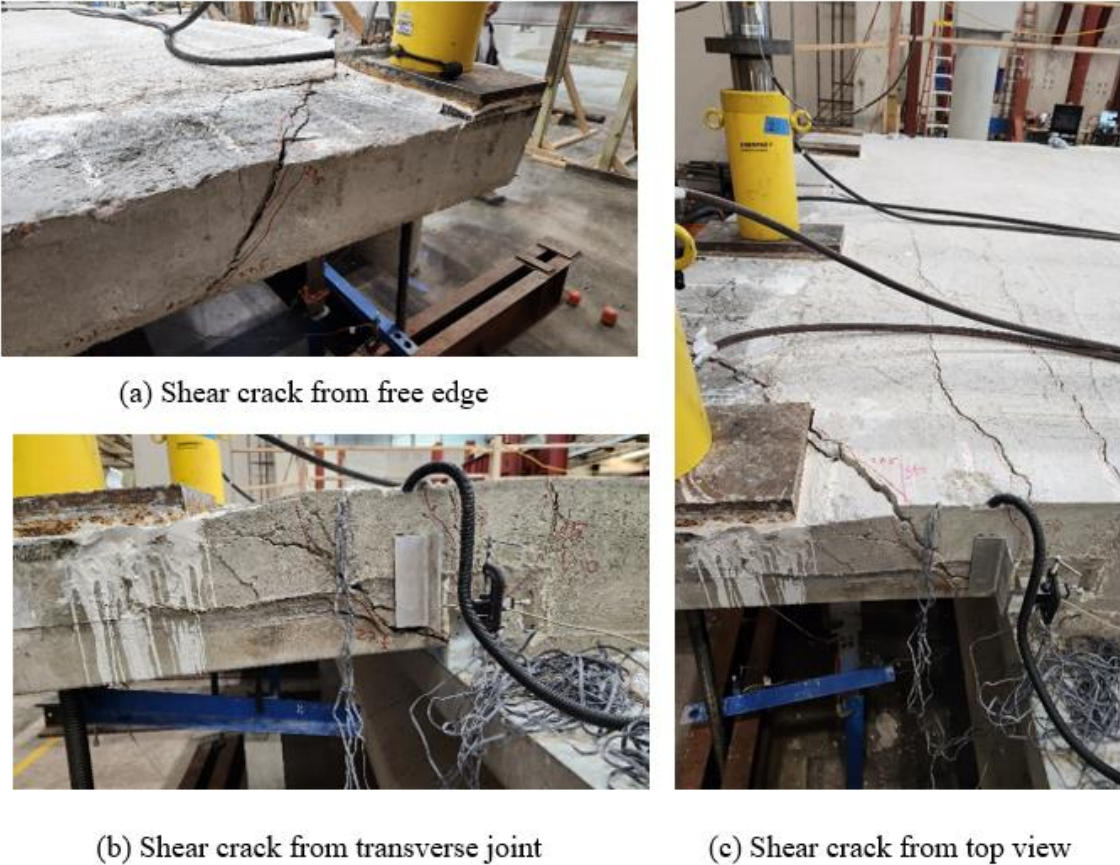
Test 9 – Hand Welded Panel Pair Long Overhang – Shear Crack at Ultimate Load
